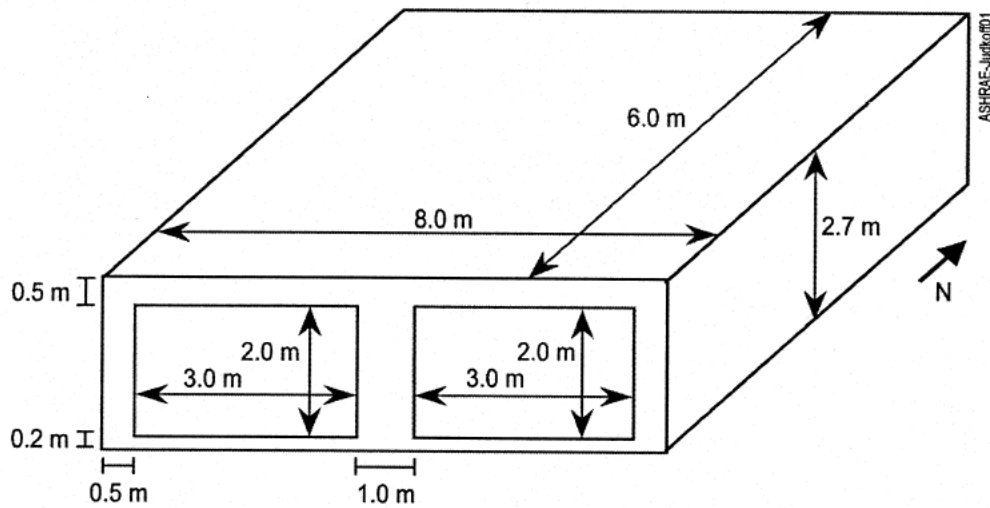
Building geometry based on BESTEST Case 600 (Ashrae, 2017).
